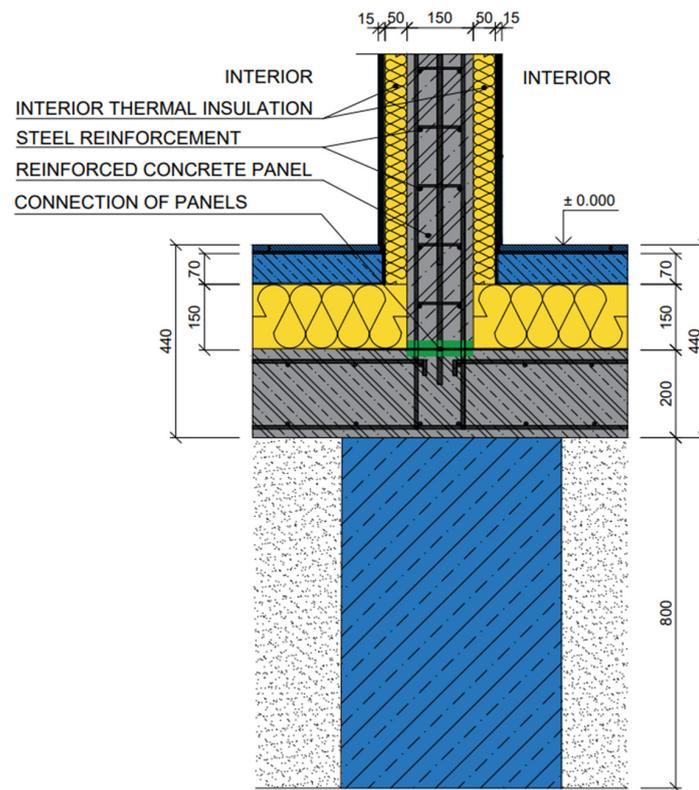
"Detail D", the connection of the inner load-bearing panel to the base plate.
